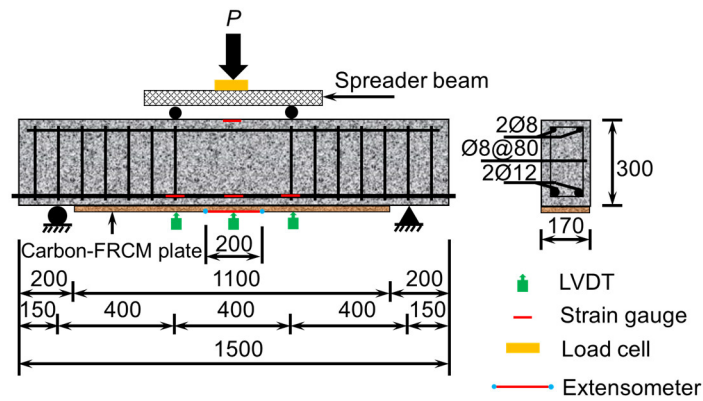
Detailed information on four-point bending tests of beams with externally bonded carbon-FRCM.
